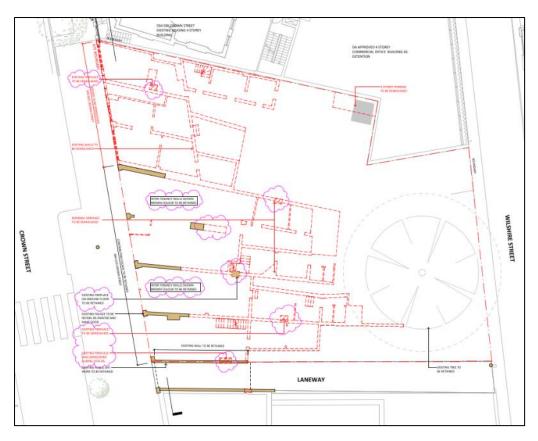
Amended ground floor demolition plan showing retained walls in brown
